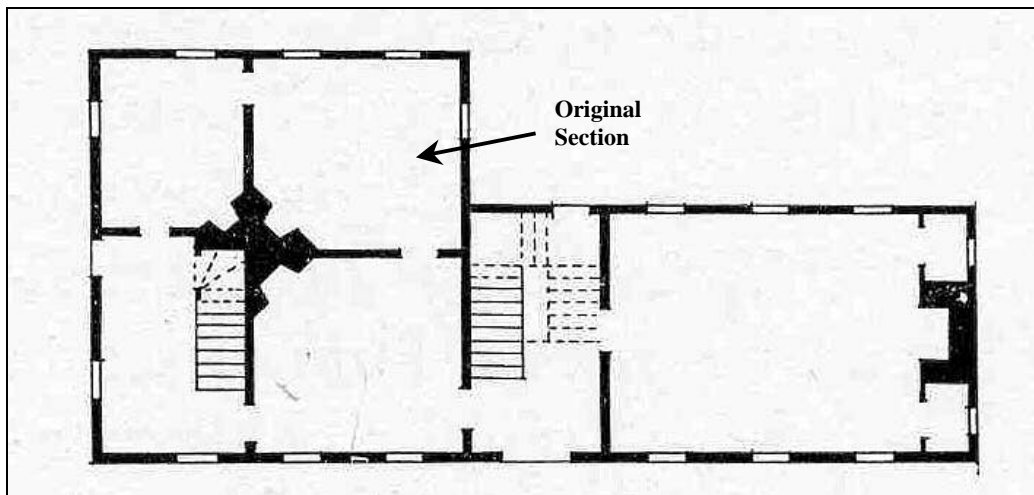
Floorplan of the Peyton-Randolph (Randolph-Peachy) House showing cross-shaped fireplace (Waterman 1946:70).
